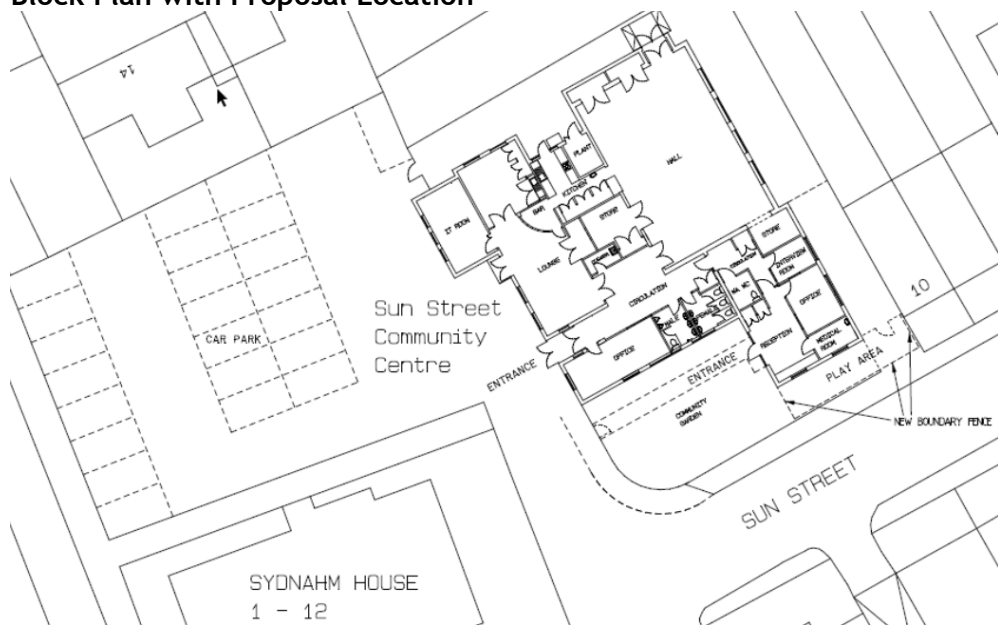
/19/02/07 - Existing Block Plan (received 23/08/2019)
